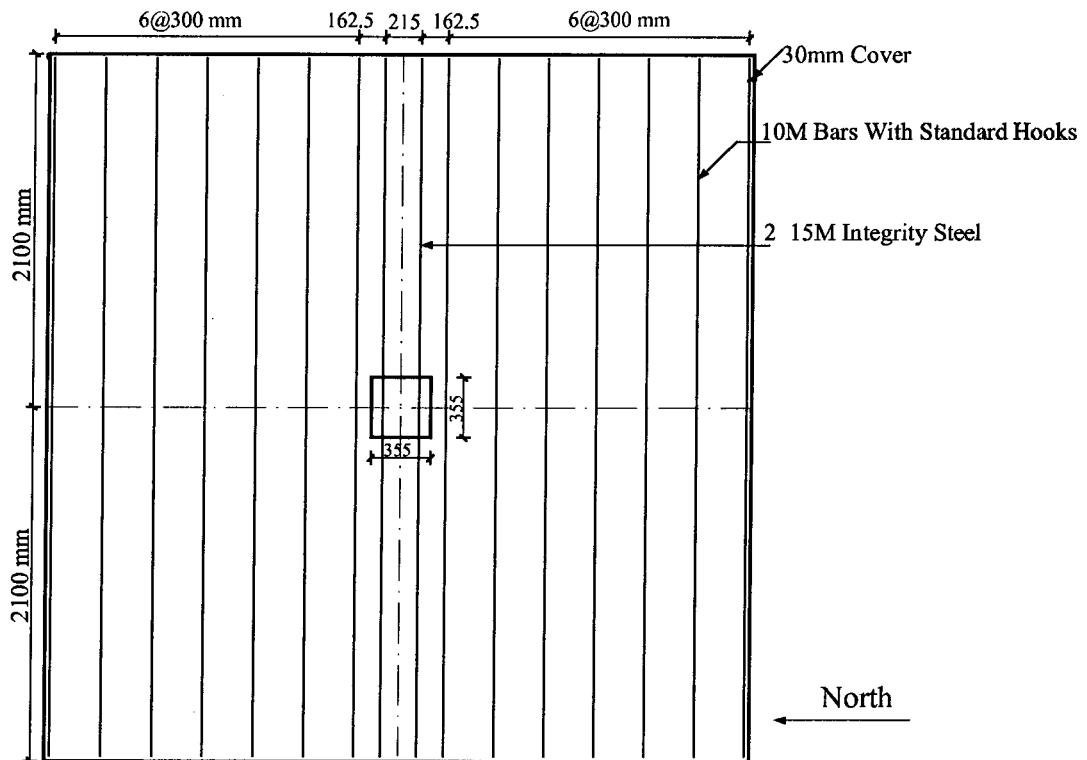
Layout of Positive Reinforcement In E-W Direction
